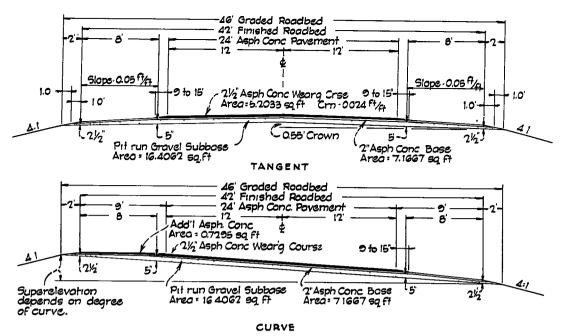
Typical flexible pavement sections, North Dakota State Highway Department.
